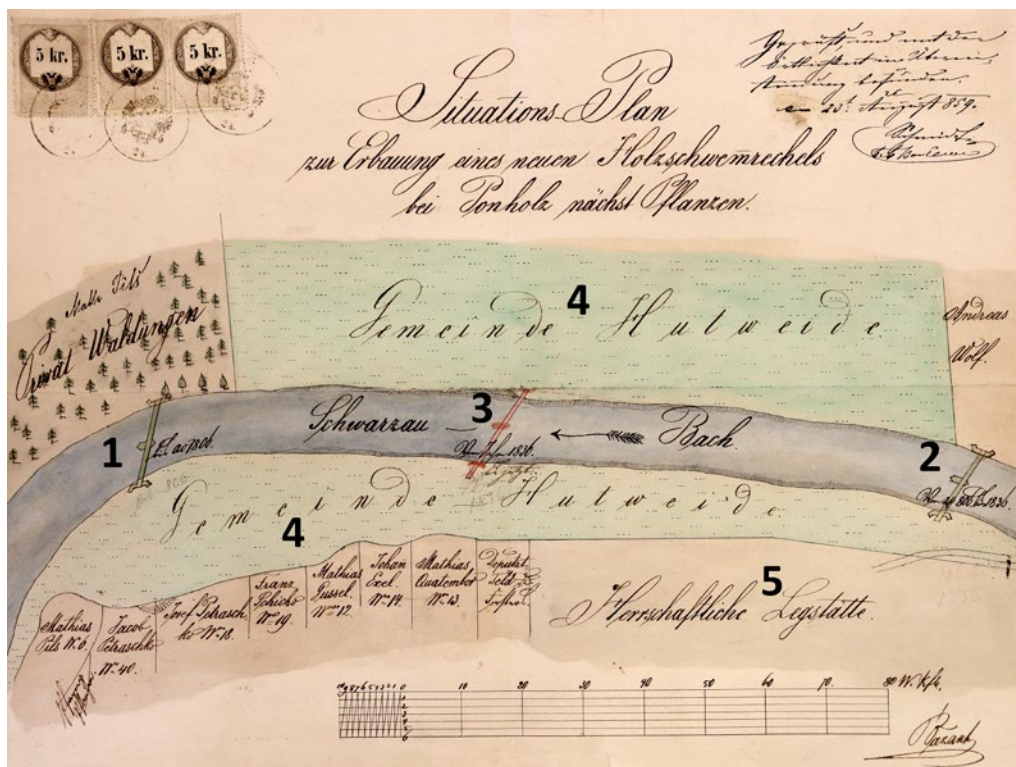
The situation plan for the construction of the new Ponholz barrier outside Blansko near Kaplice, 1859, source: SOKA Český Krumlov, fonds OÚ Kaplice, cart. no. 10. Legend: 1 – the position of the barrier built in 1780/1781, which remained on the site until 1806; 2 – the position of the barrier built in 1806, which remained on the site until 1836; 3 – the position of the wooden barrier built in 1836, which was replaced by a new barrier with stone piers in 1859/1860; 4 – municipal pastures; 5 – manorial timber yard
